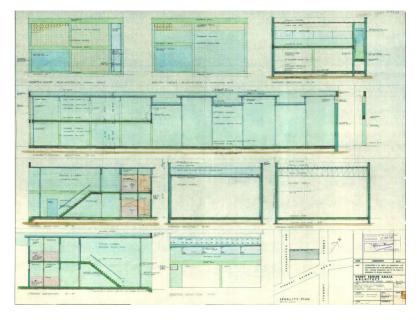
1962 – Elevations and sections for proposed new bookstore and offices at 133-135, by Harry Seidler, architect, working drawing dated 8 February 1961. The BA was approved on 20 March 1962 and the existing terraces at the site were demolished in 1964, but the building was never constructed (Source: City of Sydney Archives, Pyrmont St (133-135) (01/01/1962 - 31/12/1962), [A-00547430]. https://archives.cityofsydney.nsw.gov.au/nodes/view/1411167)
